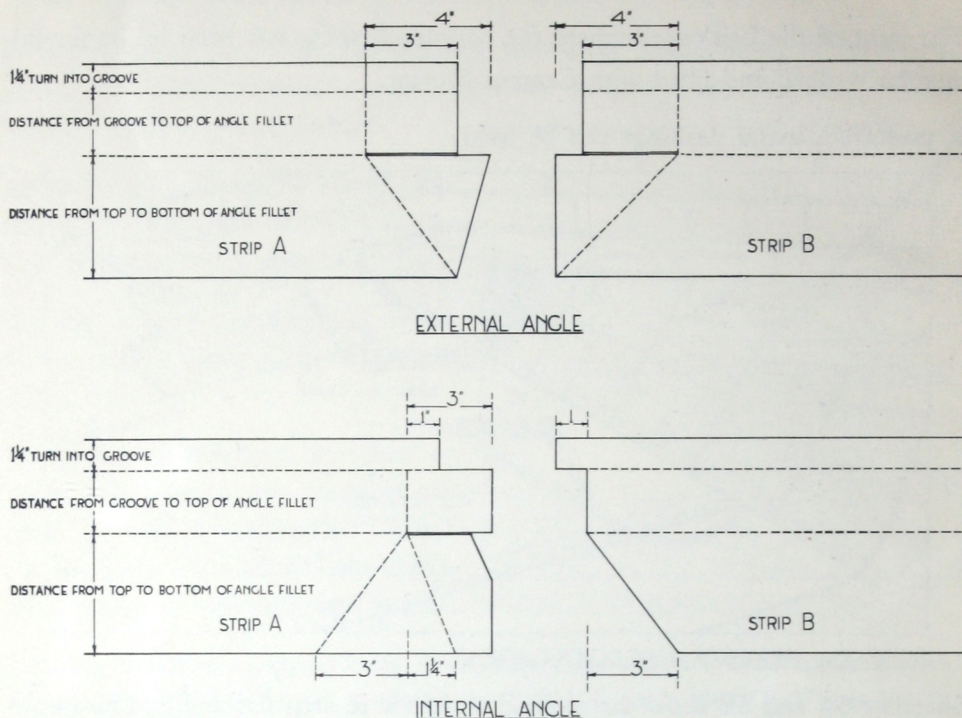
A and 6B show the method to follow in step flashing and also how to fix flashings at both internal and external angles.
